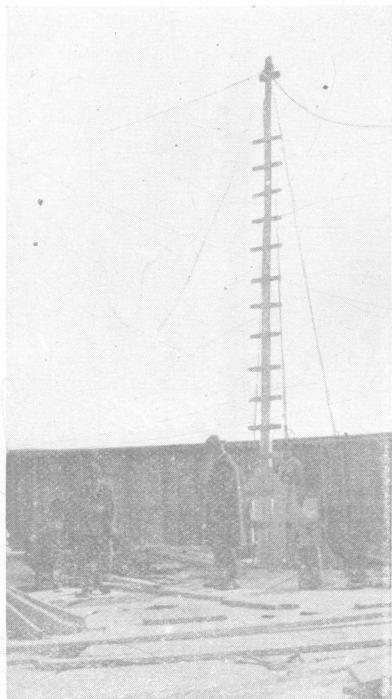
Gin pole for raising roof trusses. Note truss members being assembled on floor.
